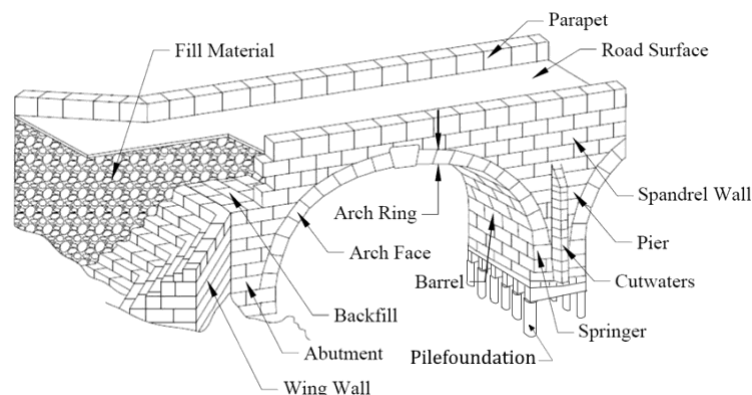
Terminology of a masonry arch bridge on a wooden pile foundation, by T. Siwowski (2018).
